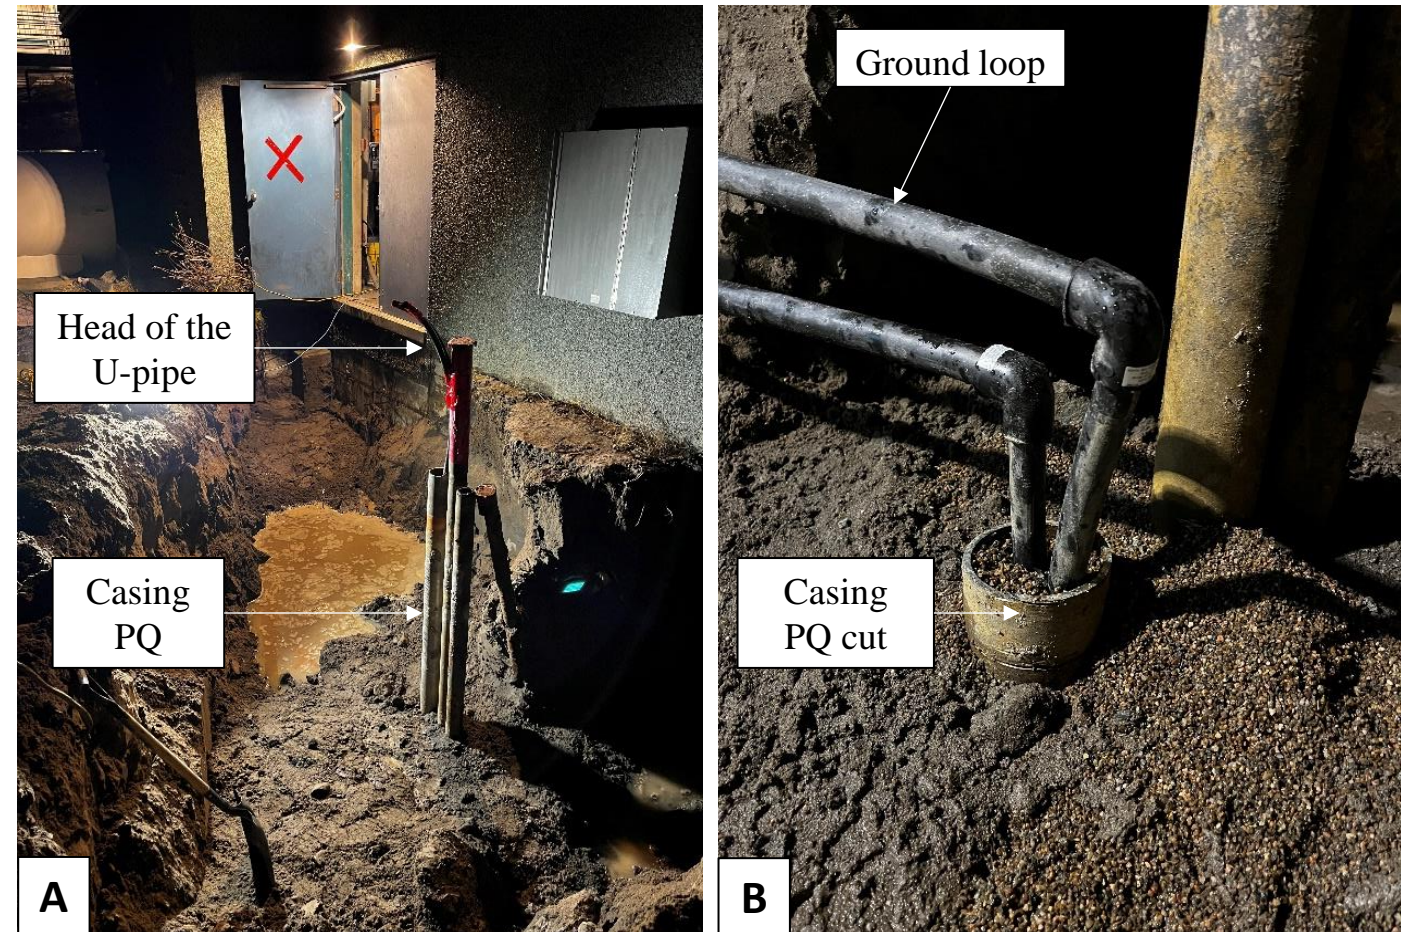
Ground heat exchanger installed in front of the Forum basement where is the mechanical room entrance. A- Excavation of the soil, B- Connection between the head of U pipe and to horizontal pipes (IN and OUT of loop) extension. Credits Induktion Géothermie.
